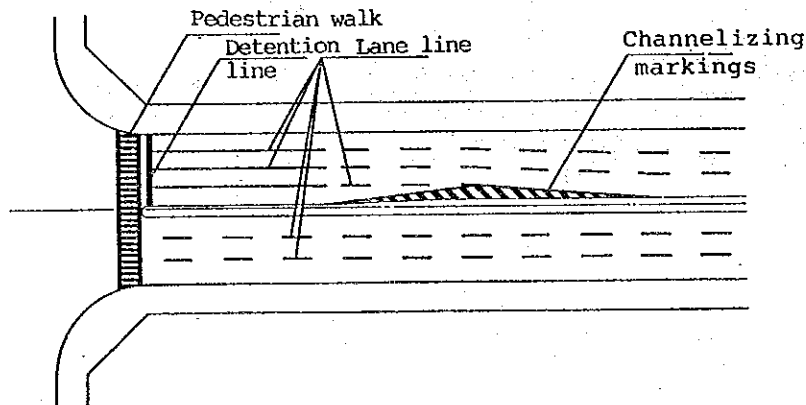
TYPICAL PLAN OF ROAD MARKING.
